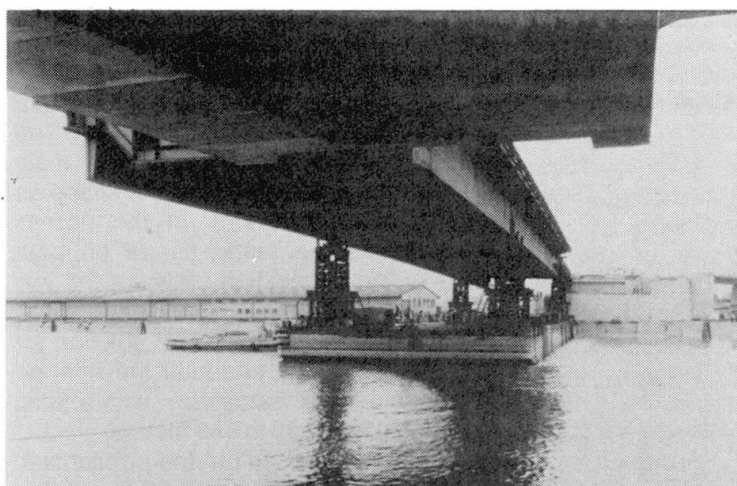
The Queen Mathilde Bridge, at Rouen; an isostatic span is placed from a barge on its cantilever supports
